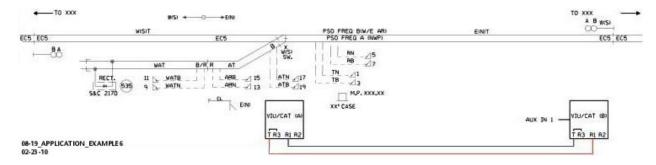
4th St. VIU/CAT Location Plan Illustration Example
